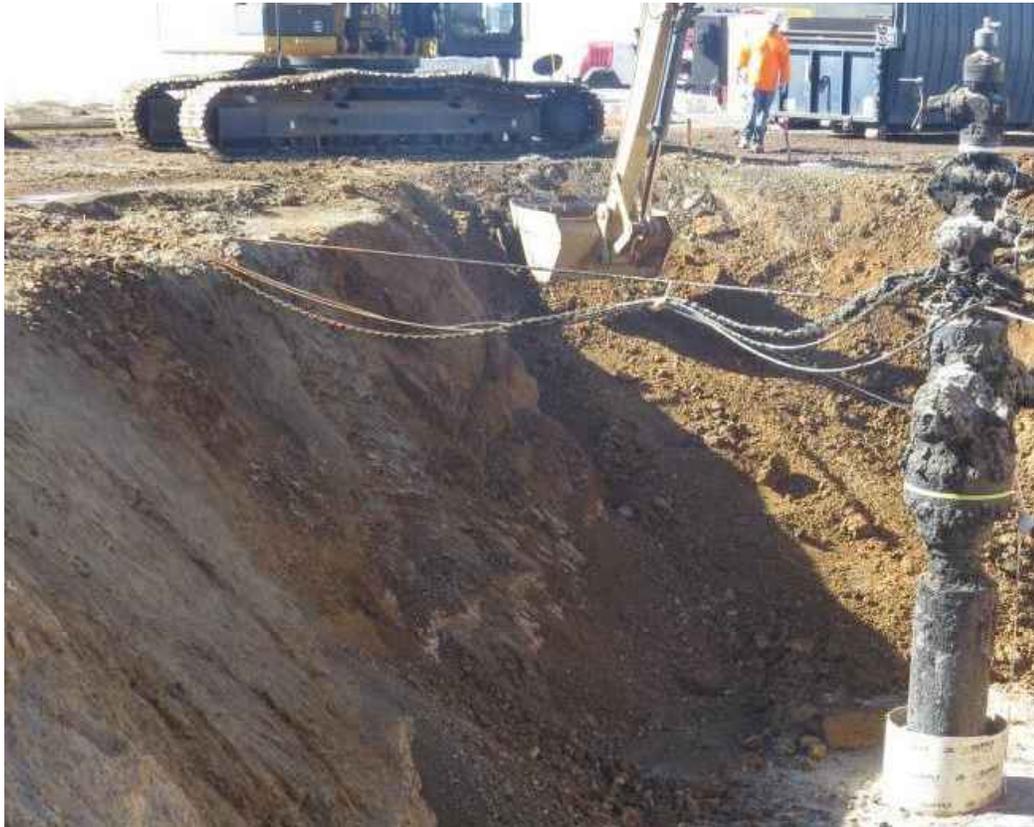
Excavator Used to Construct and Compact Earth Ramp with 3:1 Slope
